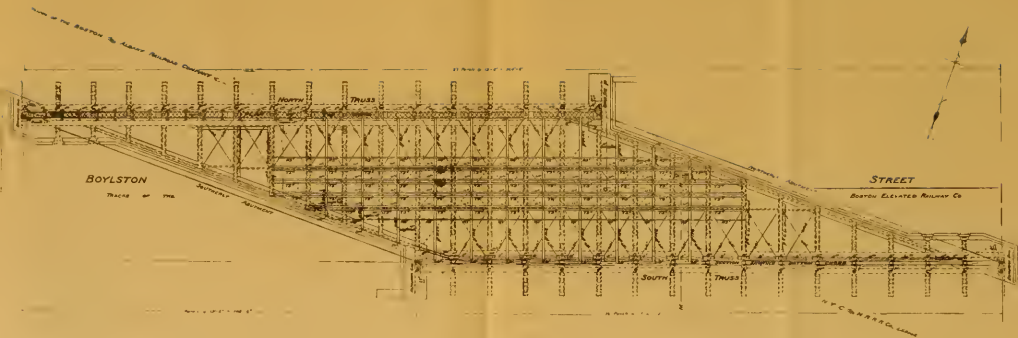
GENERAL PLAN SHOWING RELATION BETWEEN ORIGINAL STRUCTURE AND RAILWAY STRUCTURE.
